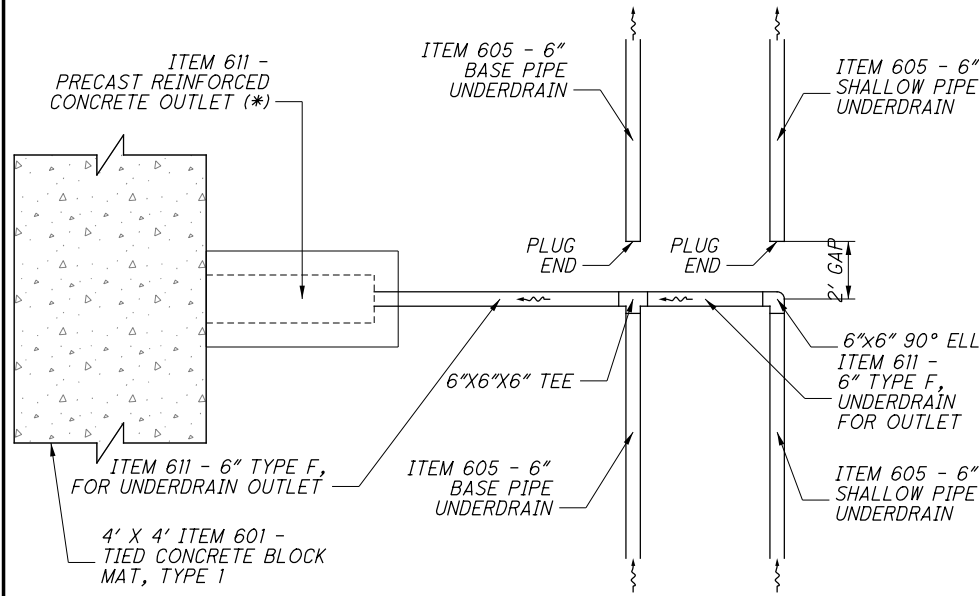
, 6" SHALLOW PIPE UNDERDRAIN, AS PER PLAN
